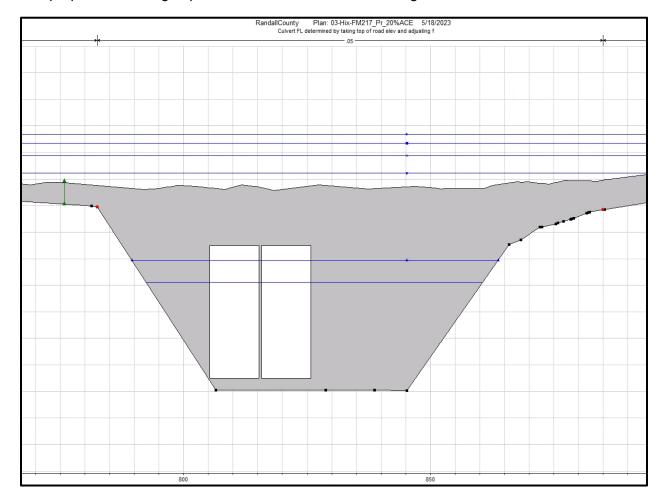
Proposed 20% LOS upstream cross section at Hix Road/FM 217 crossing of unnamed stream.
